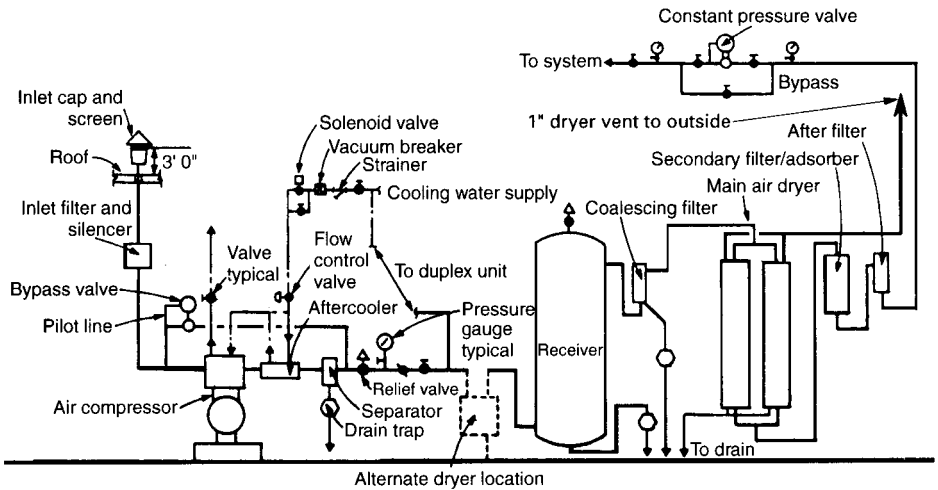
Typical detail of industrial air compressor assembly.
